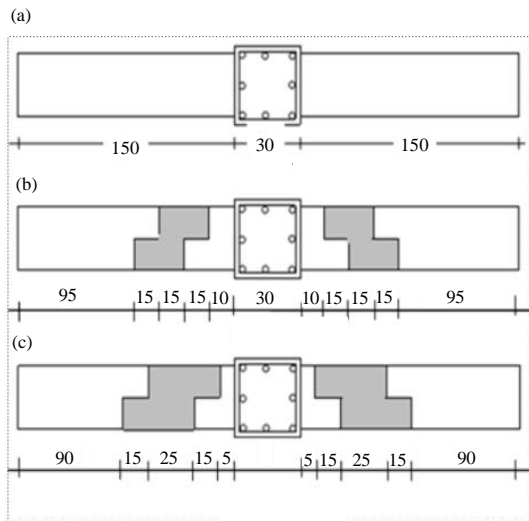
Top view of the specimen: a) BN; b) BTK 30 and c) BTK 40
